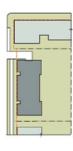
street setbacks consistent with the existing established building alignments.
